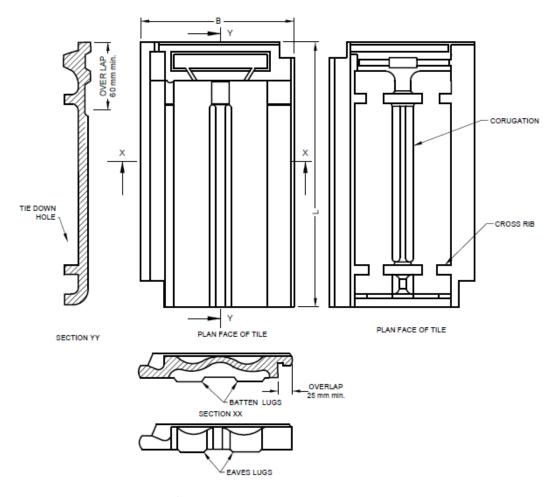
TYPICAL DETAILS OF MANGALORE TILE
